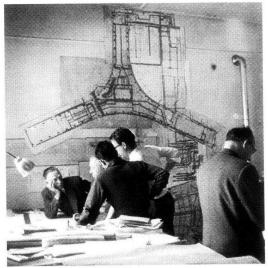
Unesco House, Place Fontenoy: Site plan and "Unesco in Paris," 1953
